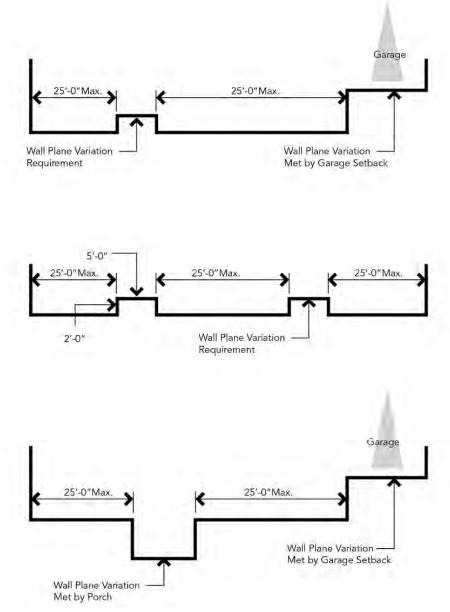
Examples of Configurations Meeting the Wall Plane Variation Requirement
